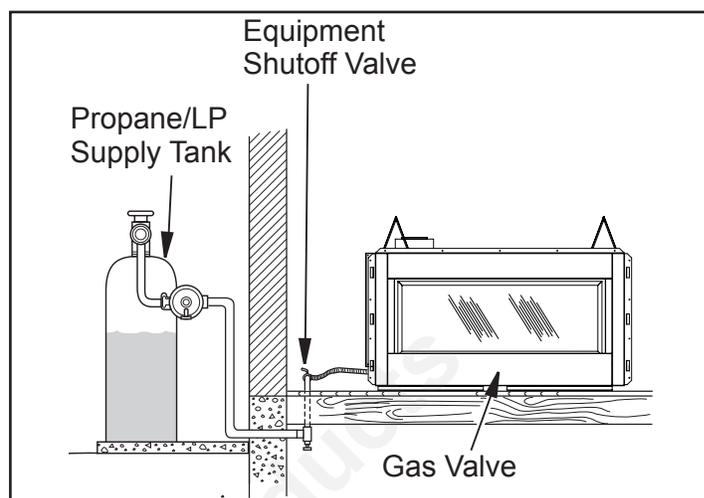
Checking Gas Joints for Propane/LP Gas Fireplace
